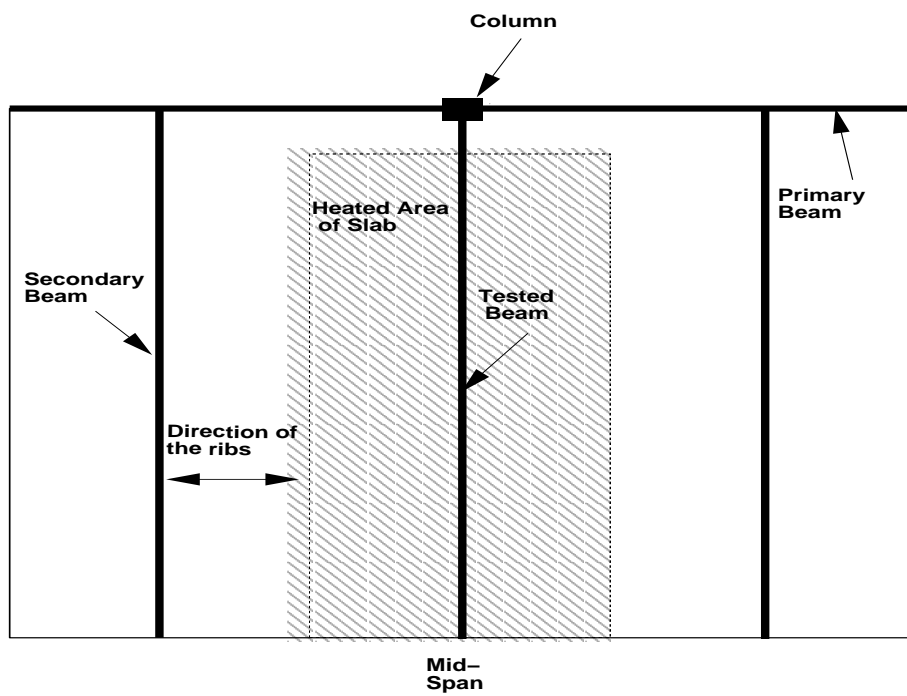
Schematic plan view of the area of the Cardington frame modelled for the analysis of test 1.
